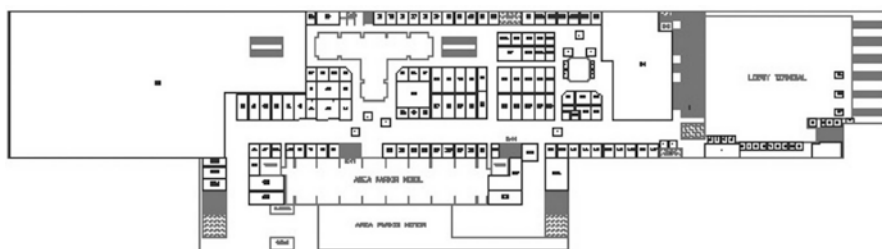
2D building shape of Blok M mall at B1 floor
